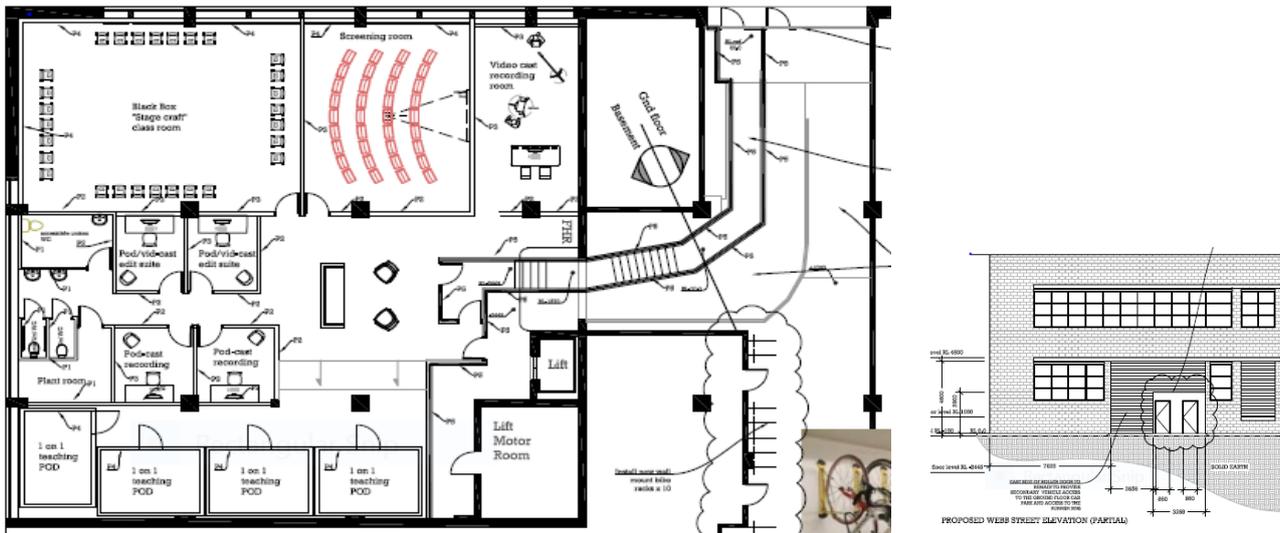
Original advertised basement and new door insert to existing Webb Street roller door
